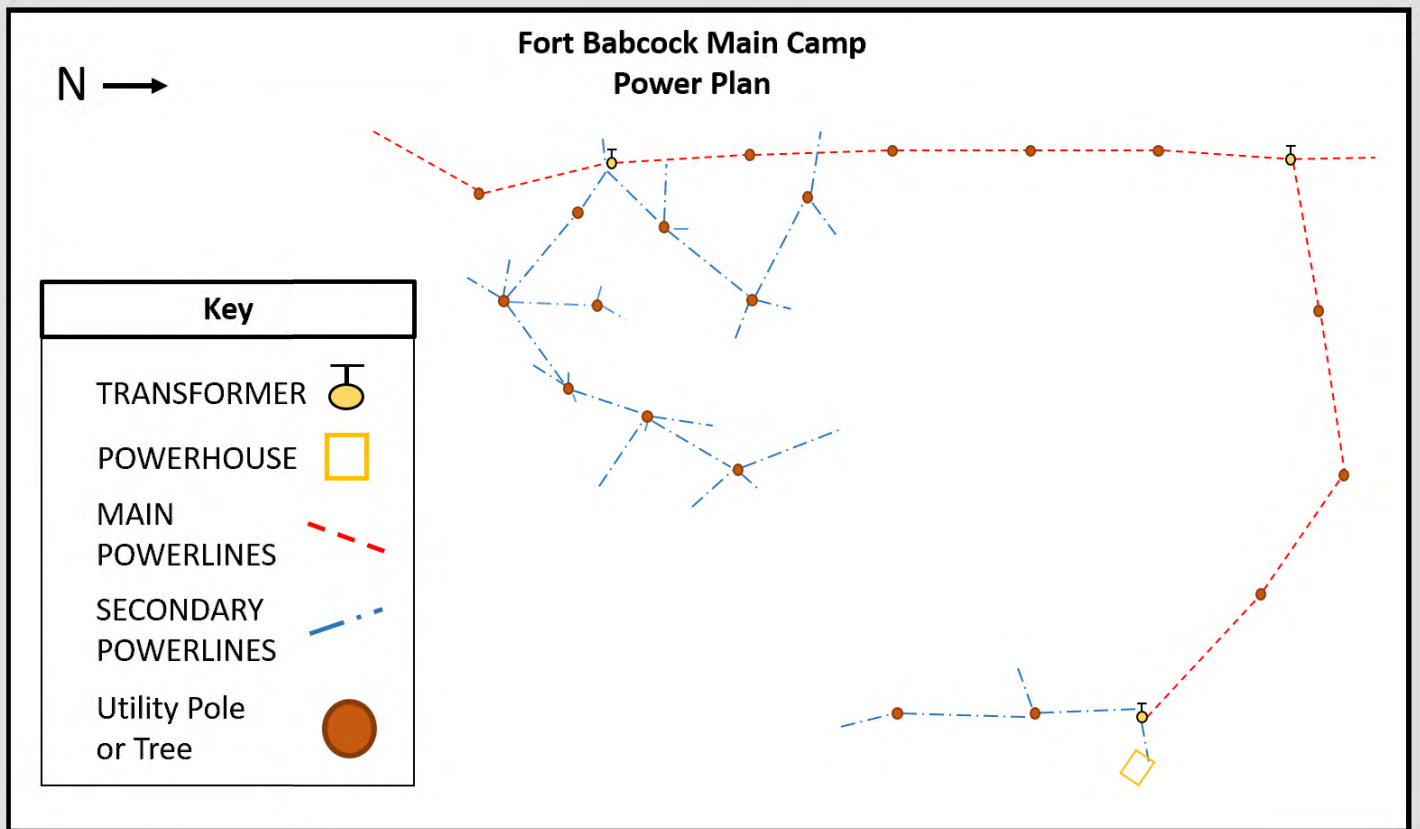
Fort Babcock Main Camp power plan (*after* 1944 Power Plan).
